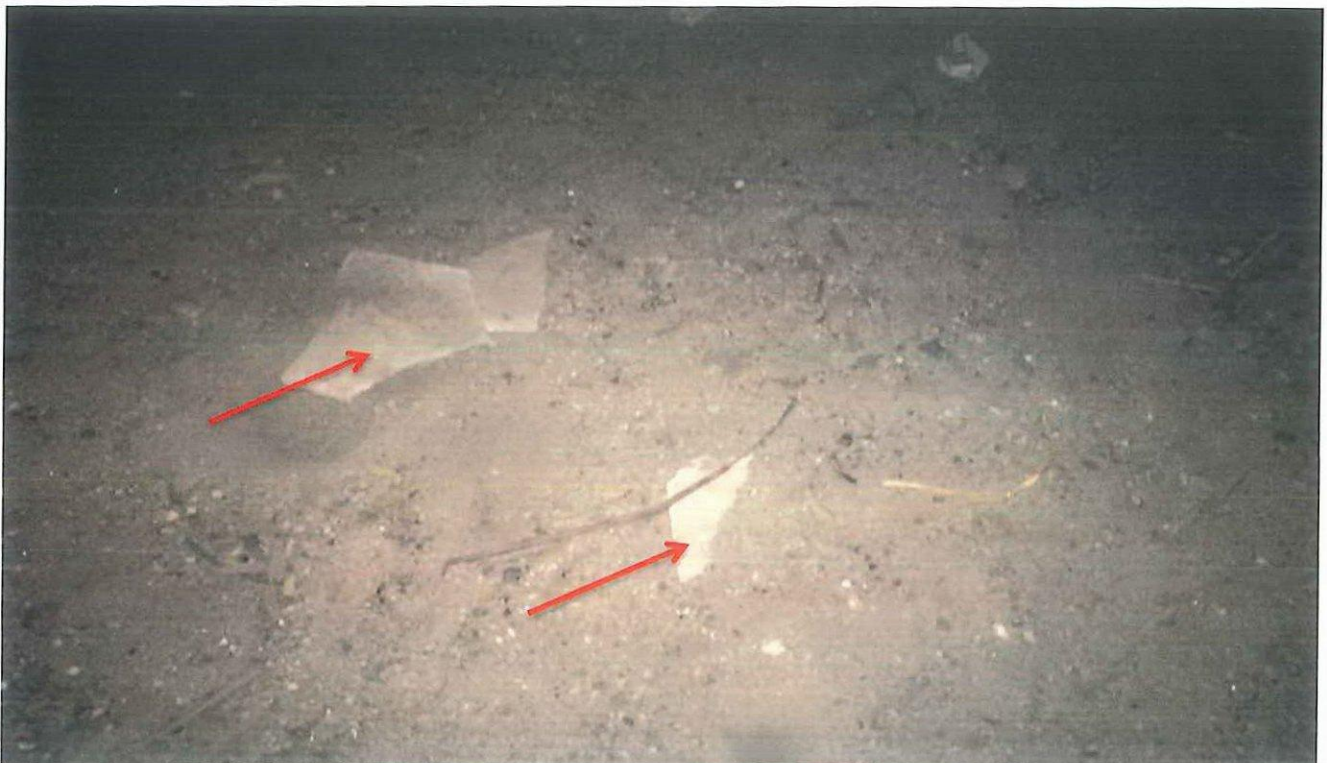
Asset D00040 – Former Lawson Golf Course – Clubhouse – Sub-floor – asbestos cement sheet debris.
